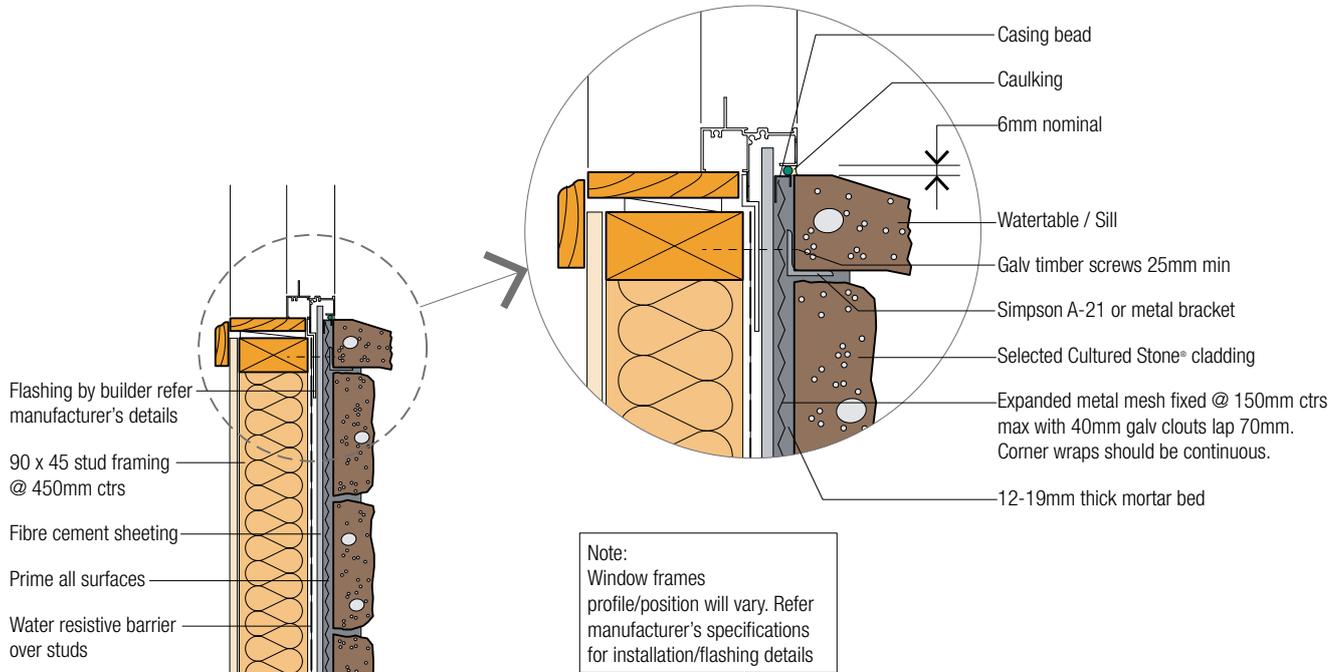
Watertable Sill at Window - Section (Dwg # CS-06.04)
